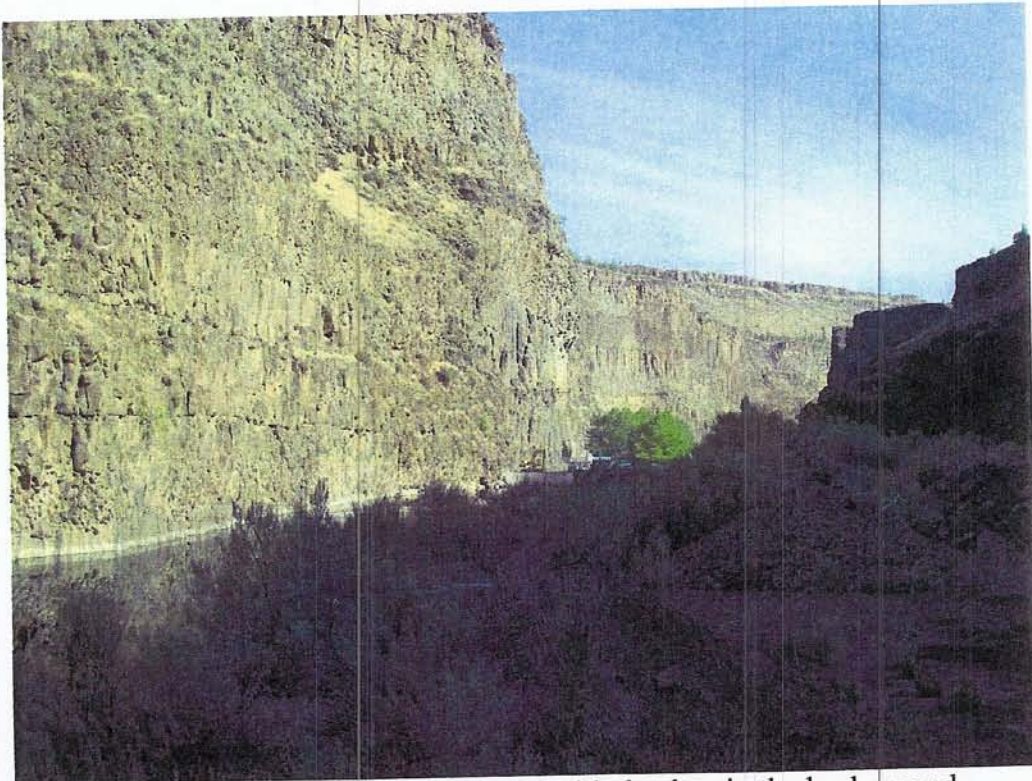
Unit 1 overview at zero degrees with the dam in the background.
